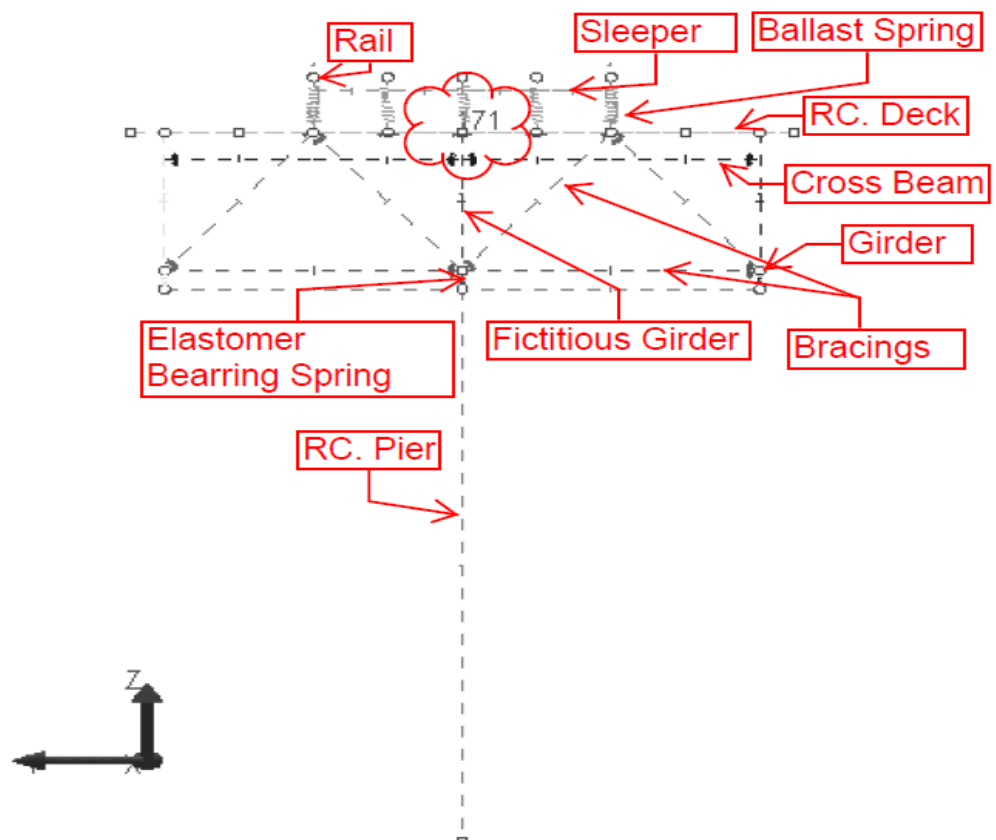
Vertical Cross-section of Bridge Model for 8.75 m Span Length
